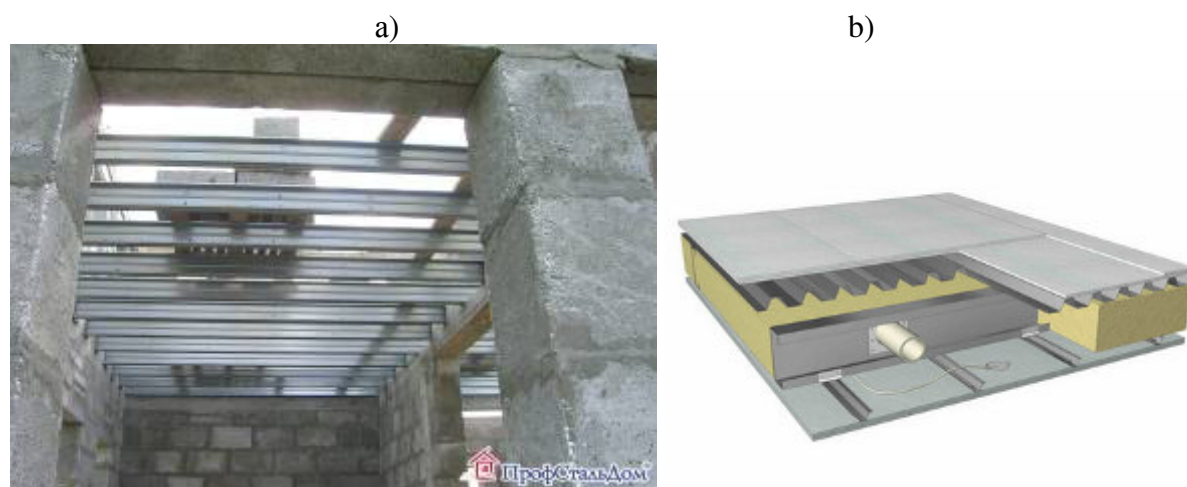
Overall view (a) and light gauge steel framing flooring make-up (b)
